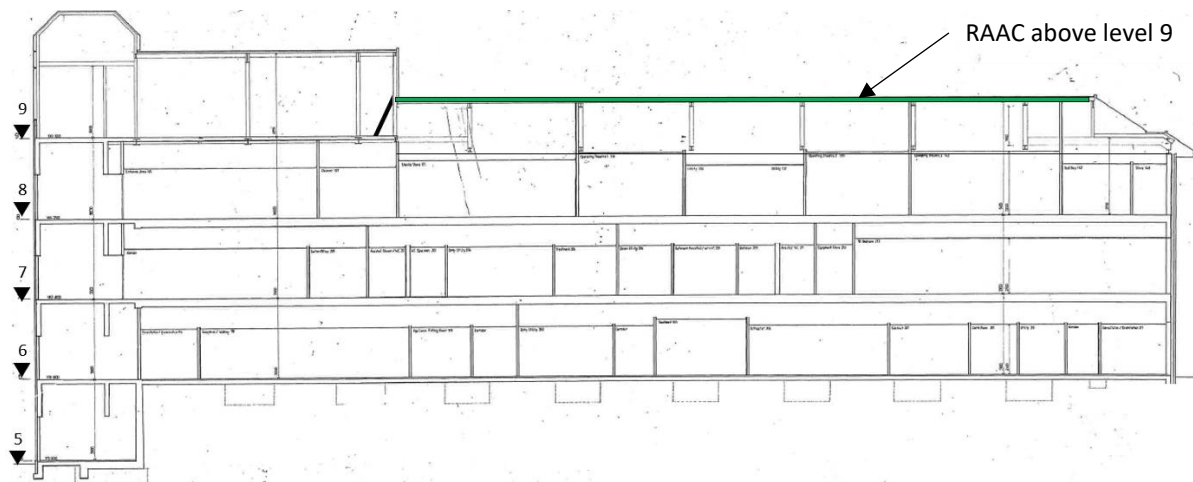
TYPICAL SECTION THROUGH BUILDING
